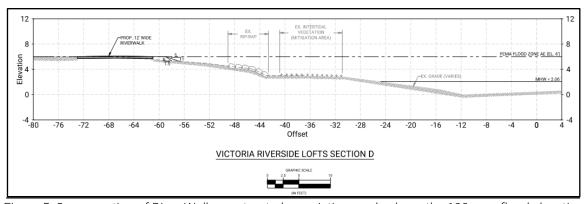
Cross section of River Walk constructed on existing grade above the 100-year flood elevation
